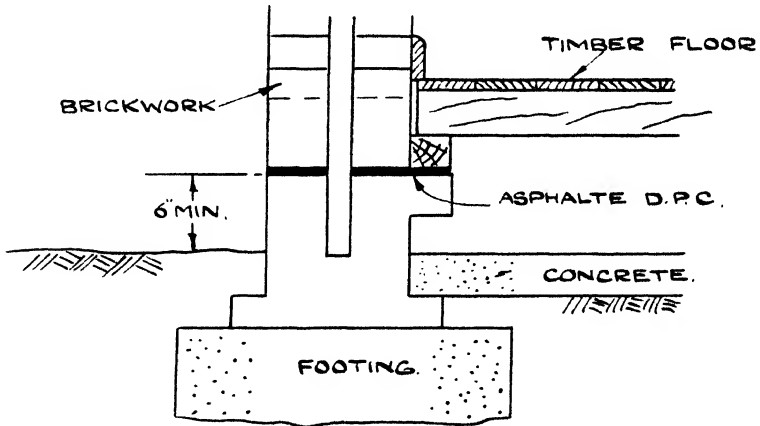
PLACING OF A D.P.C. IN RELATION TO A TIMBER JOIST FLOOR
